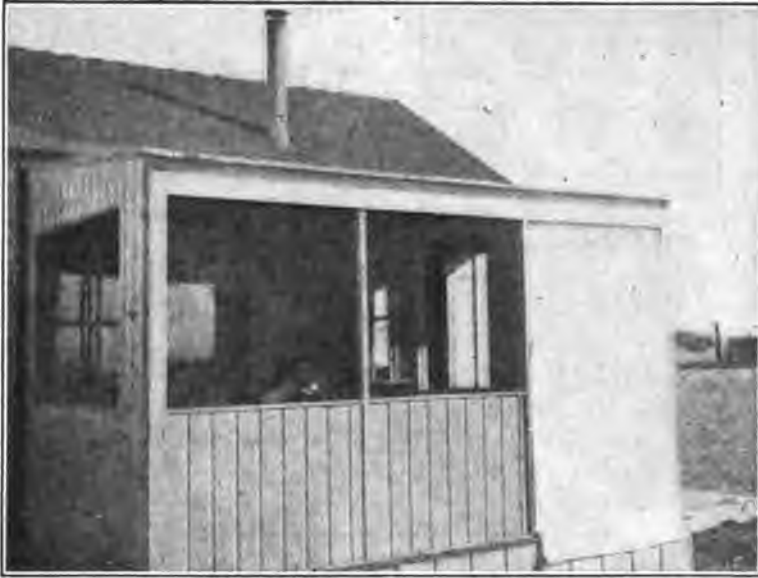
A good method of building a porch on the back of a cottage for country use.
